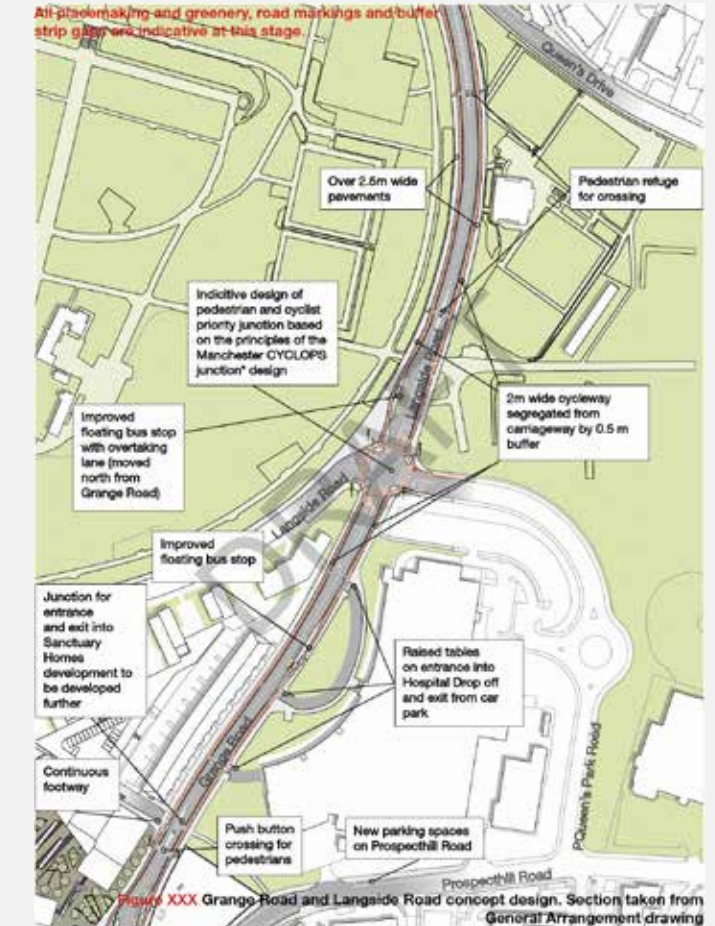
Figure XXX Grange Road and Langside Road concept design. Section taken from General Arrangement drawing
